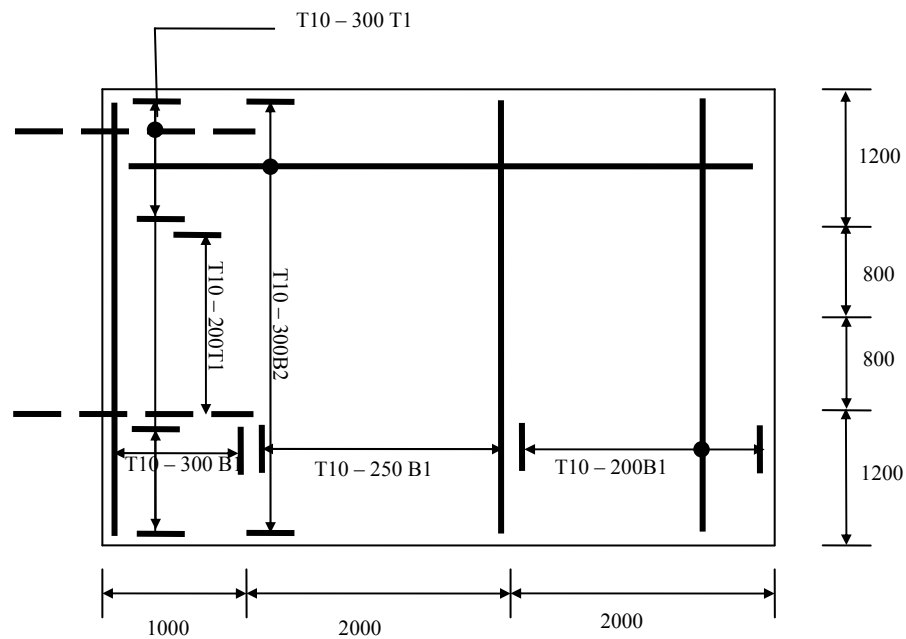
Reinforcement Details for Worked Example 4.3
